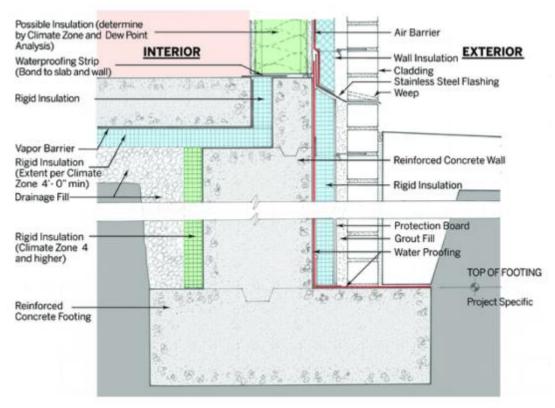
(EN340) Wall transition with insulation continuous to foundation.
